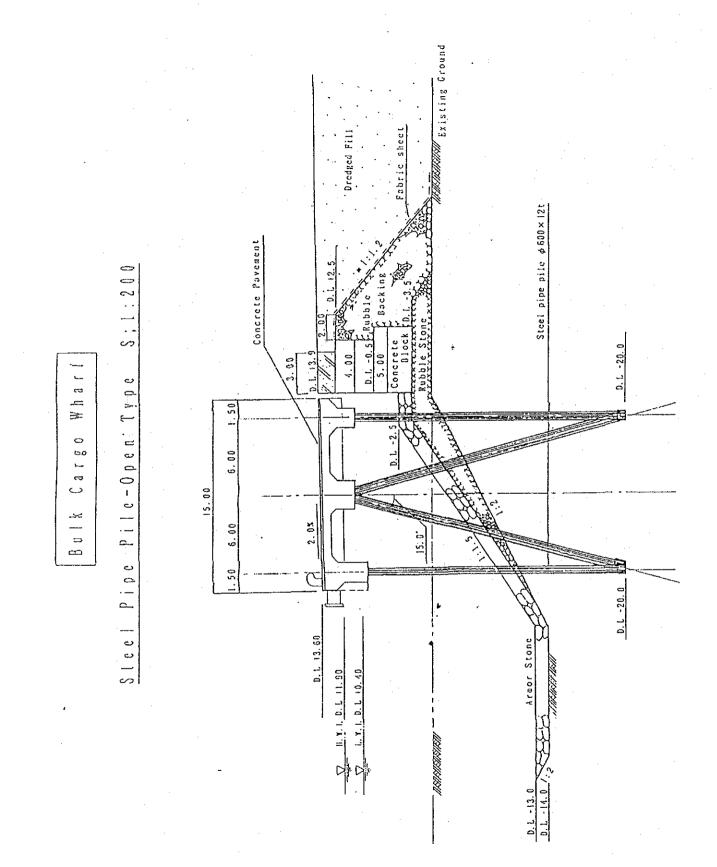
Open Type of Steel Pipe Pile for Bulk Cargo Quaywall
